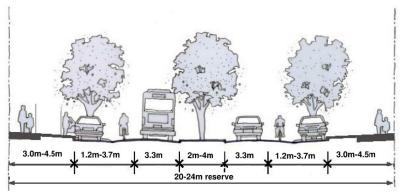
Boulevard Neighbourhood Connector Cross SectionPlan No: 885-521-01Source: Bruce Aulabaugh
